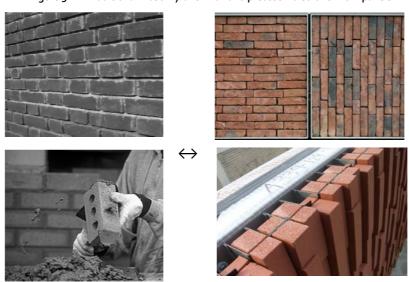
Traditional masonry brick wall and preassembled brickwork panels
